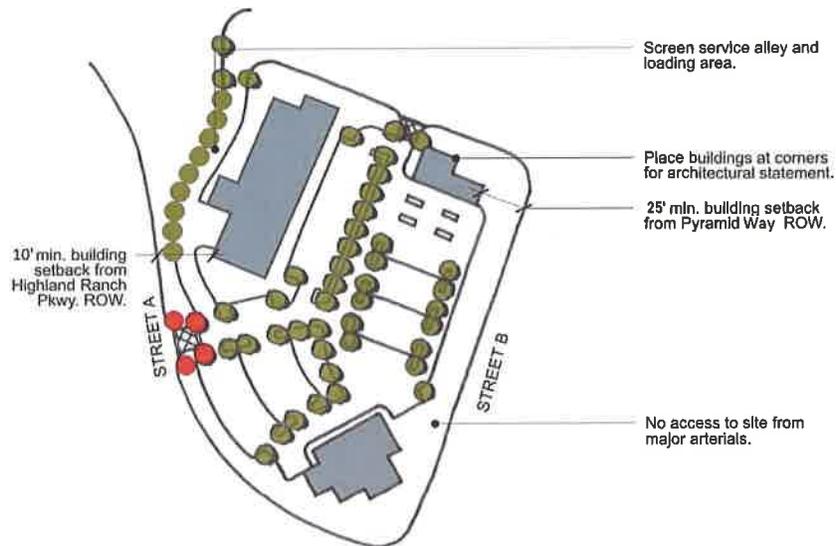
Typical Community Commercial Conceptual Site Plan
